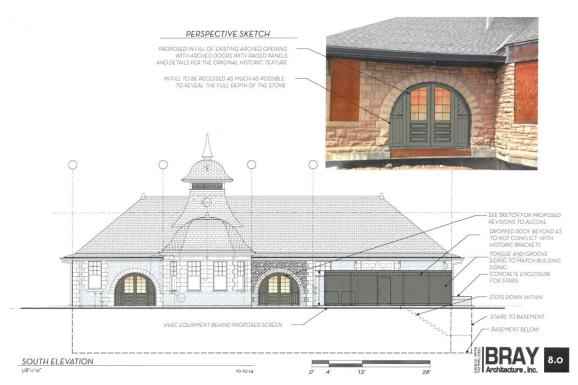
Current proposal South Elevation and Perspective Sketch, 2014.
